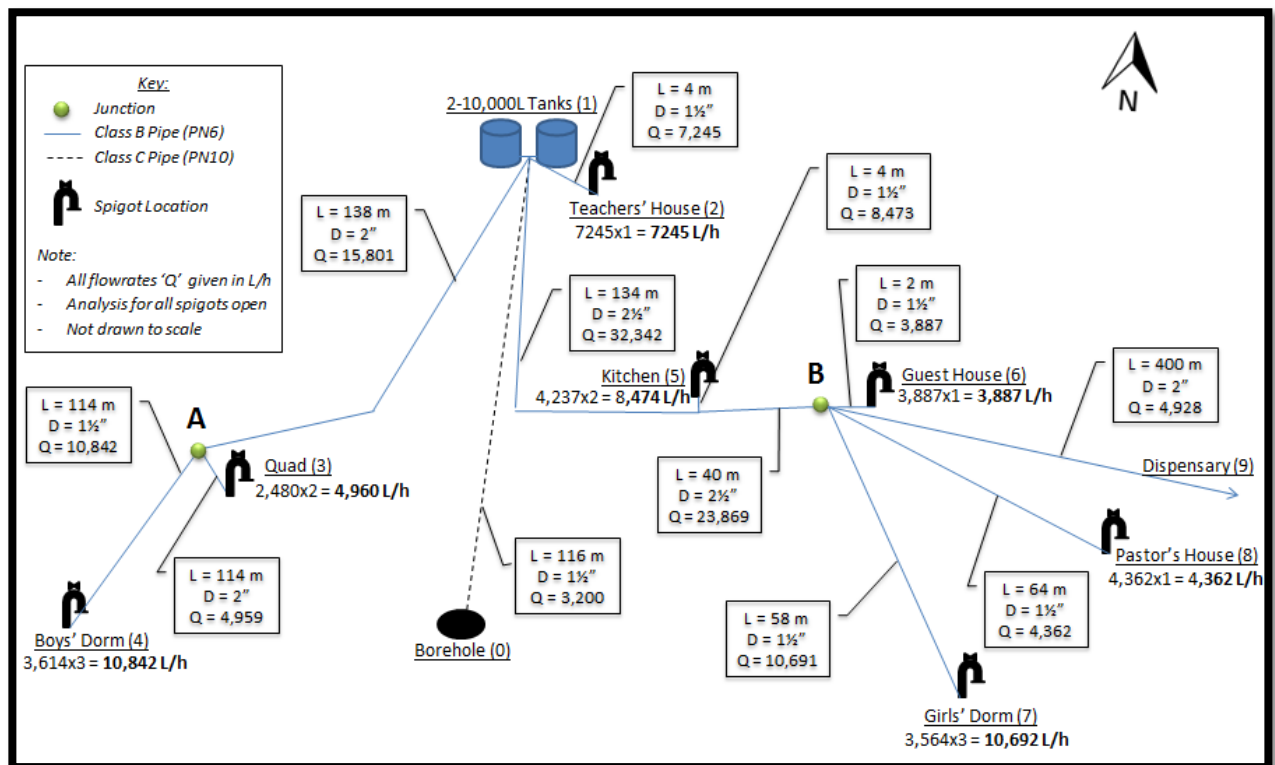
System layout containing pipe diameters, pressure ratings, and unrestricted flow rates
